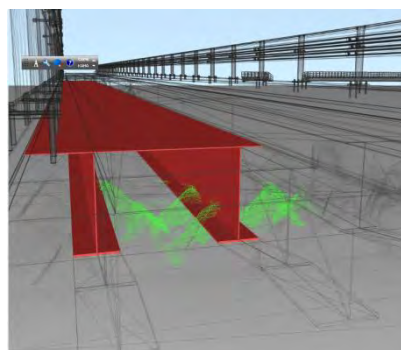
Interference of the wave dissipating concrete blocks and the bridge girder
